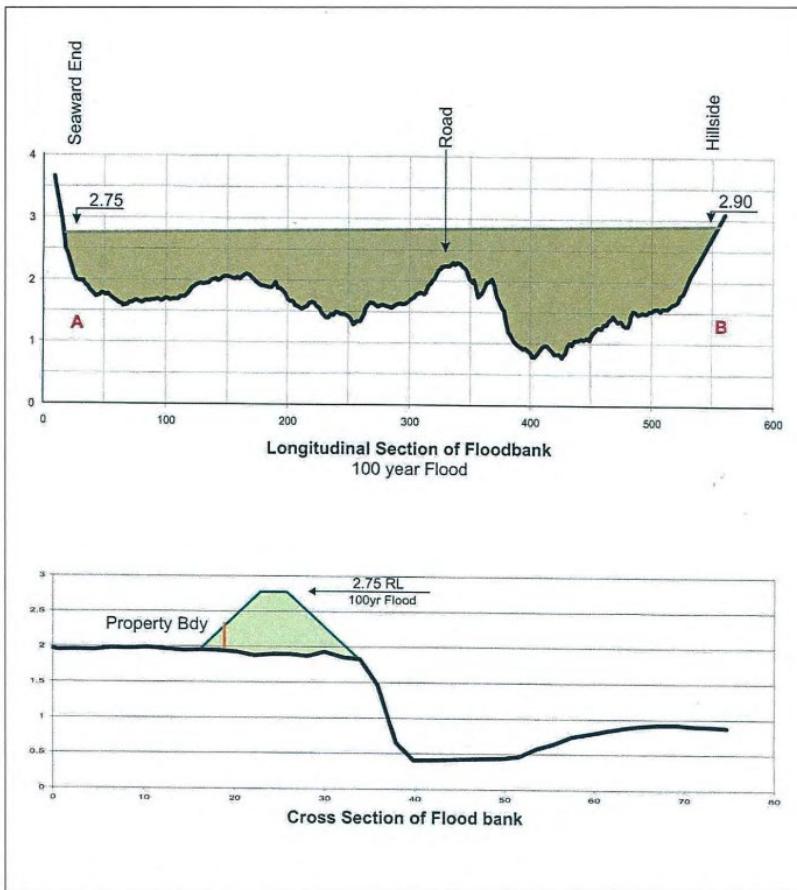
Typical cross section of stop bank of the preliminary flood scheme design.
